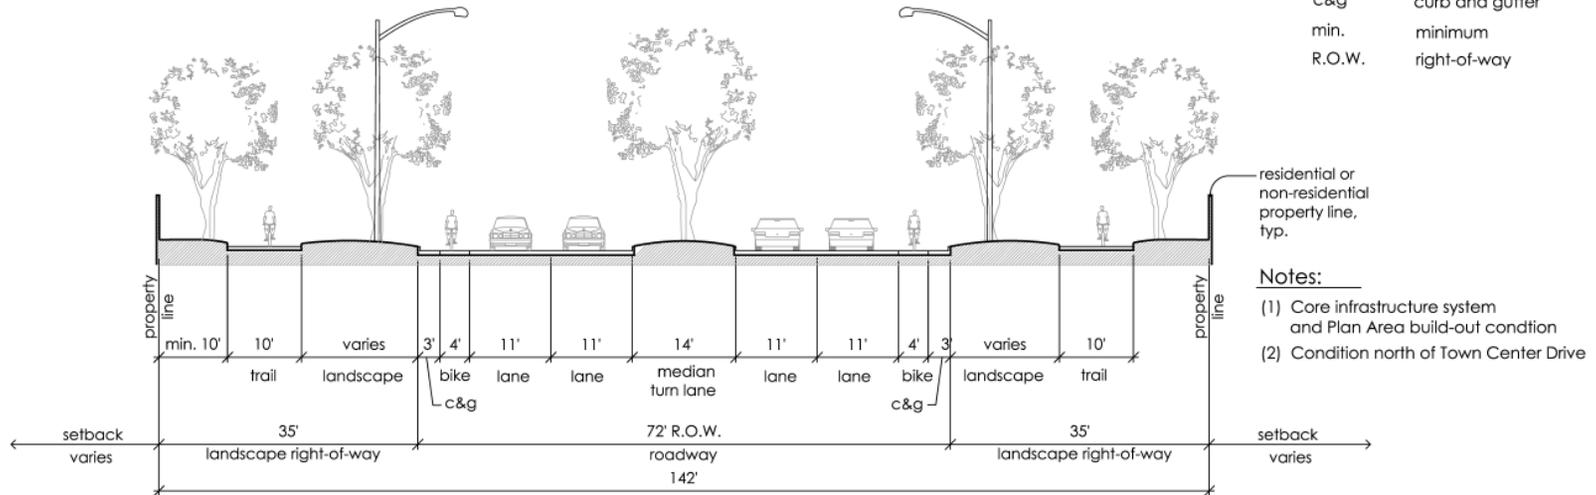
Roadway Sections—Major Arterial Street (16th Street)
